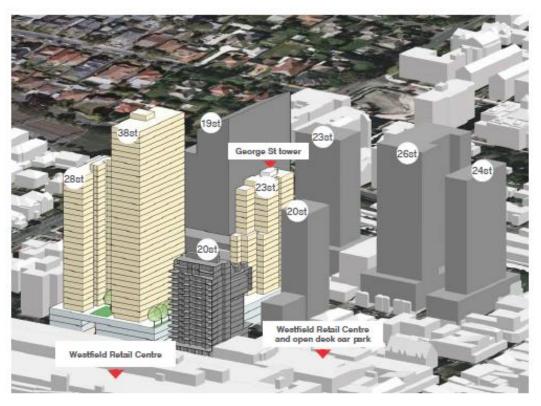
Proposed 2 tower scheme, facing south from Victoria Street (Source: 'Urban Design Report', Architectus, (13 October, 2017) p.47)
